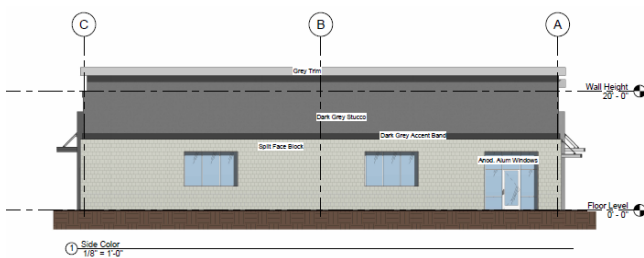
Restaurant/retail with drive-thru side elevation.
